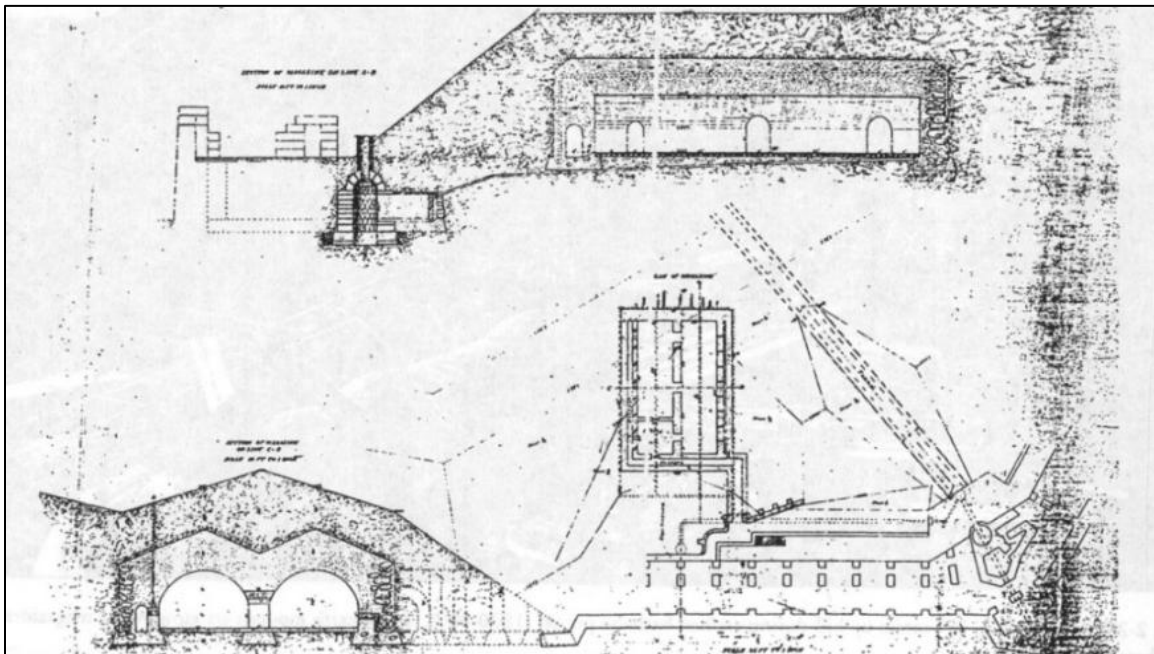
‘No. 3 Plan of Fort at Willet’s Pt., L.I. June 25, 1863’, Sections and Plan of the Main Magazine (NARA RG 77 Drawer 35 Sheet 11)
